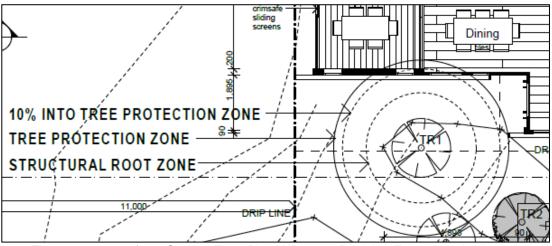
excerpt from Ground Floor Plan WD21.02 Revision F dated 23 April 2014
